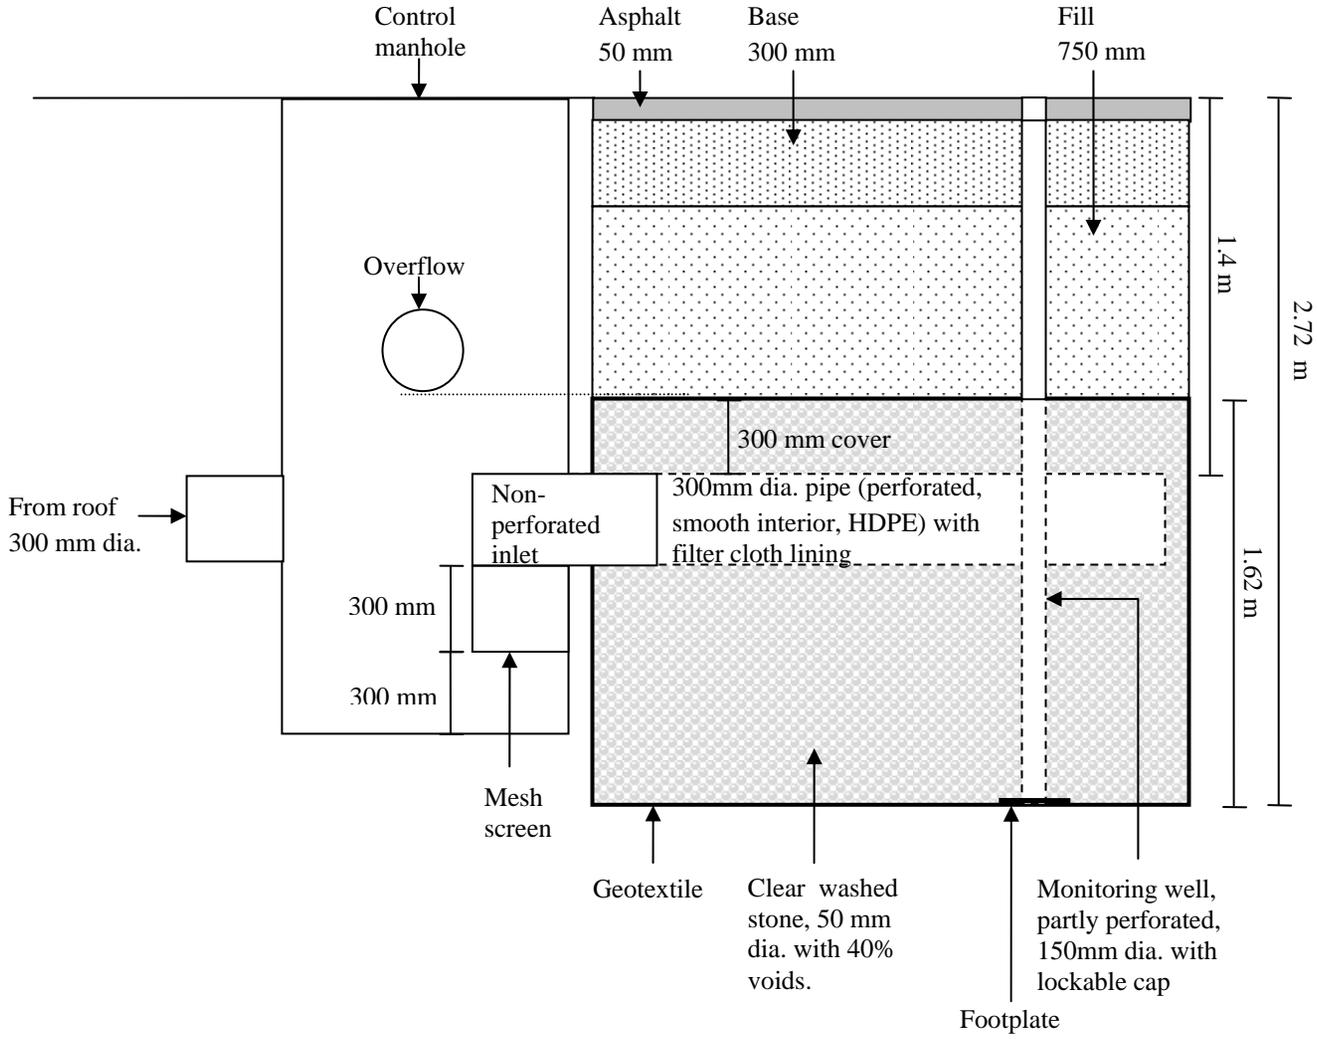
Cross section of infiltration trench receiving roof runoff only.
